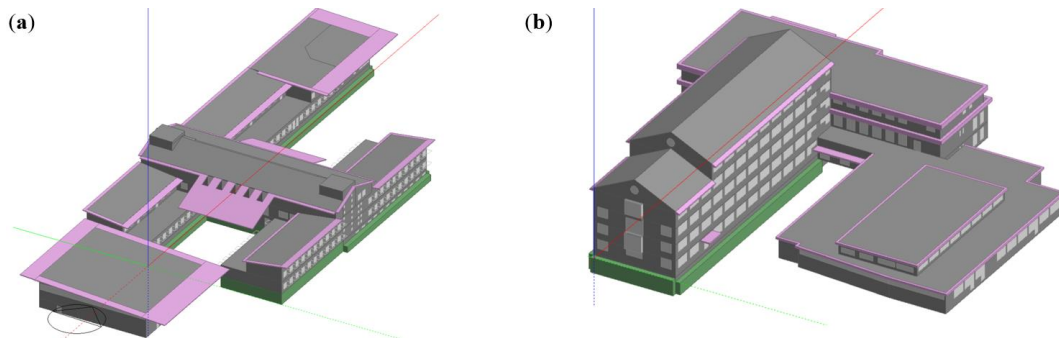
Models created in DesignBuilder concerning: (a) School Building #1; (b) School Building #2.
